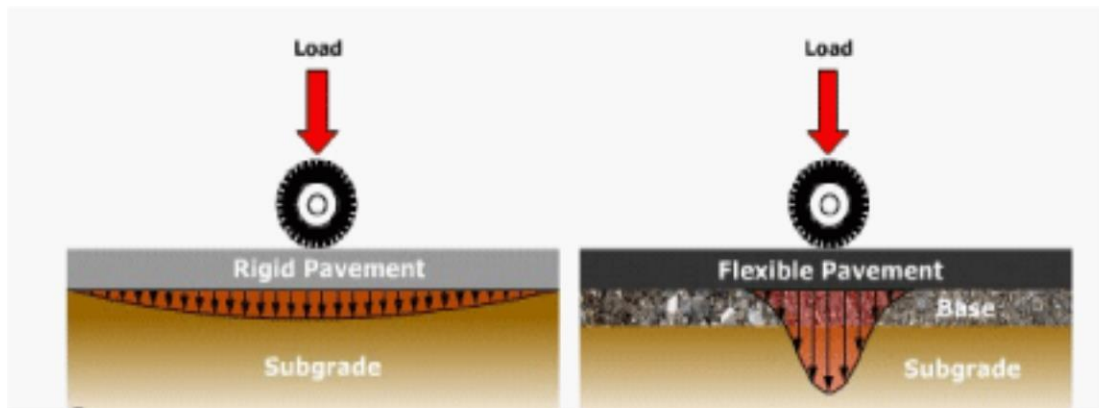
Typical stress distribution under a rigid and a flexible pavement.
